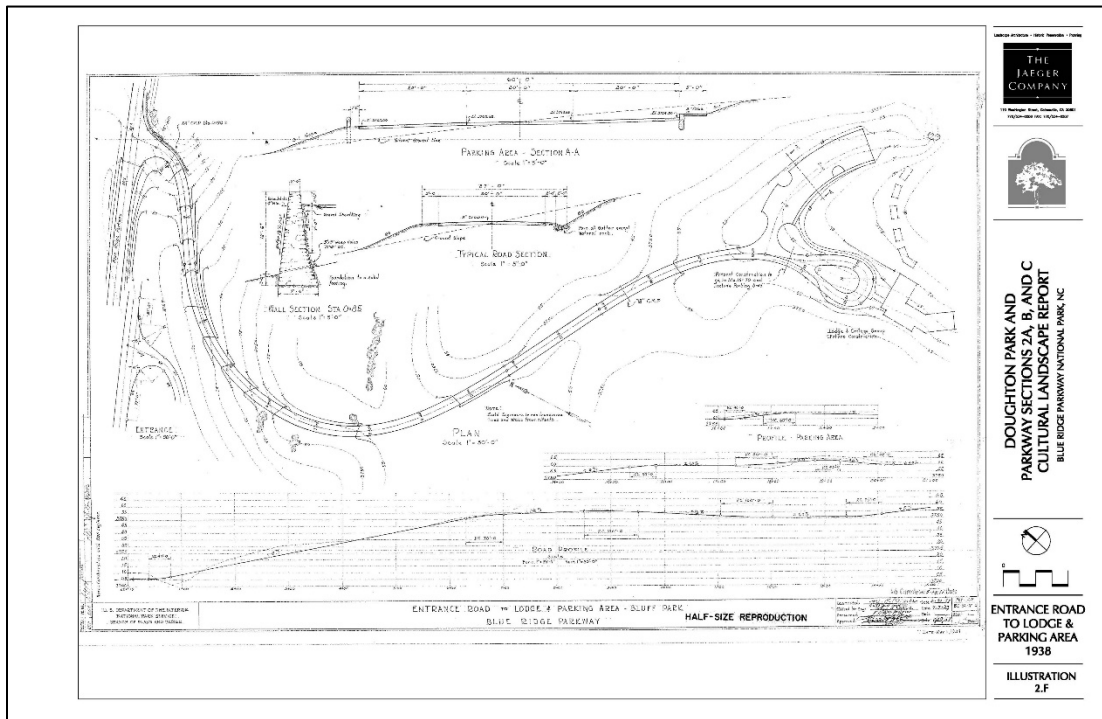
C. 1937 drawing illustrating plans for an entry road at MP 241.1 leading to the Bluffs Lodge site. The Jaeger Company, Doughton Park and Sections 2A, B and C Blue Ridge Parkway Cultural Landscape Report (2006), p. 193.
